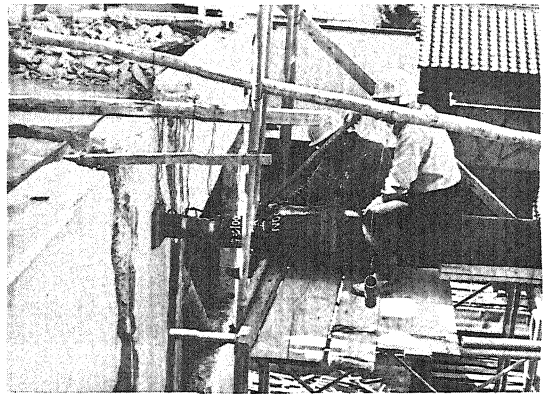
Setting of 100ft. Jacks. (Hamamatsu Open Frame Test).
